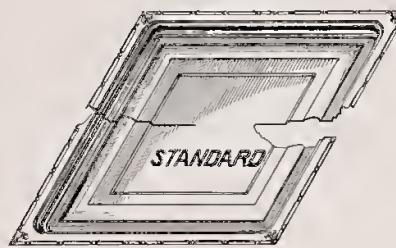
DETAIL SHOWING CONSTRUCTION OF KINNEAR'S PATENT CEILING.
